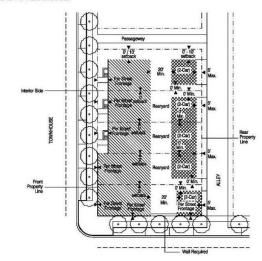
TOWNHOUSE BUILDING TYPE 2
